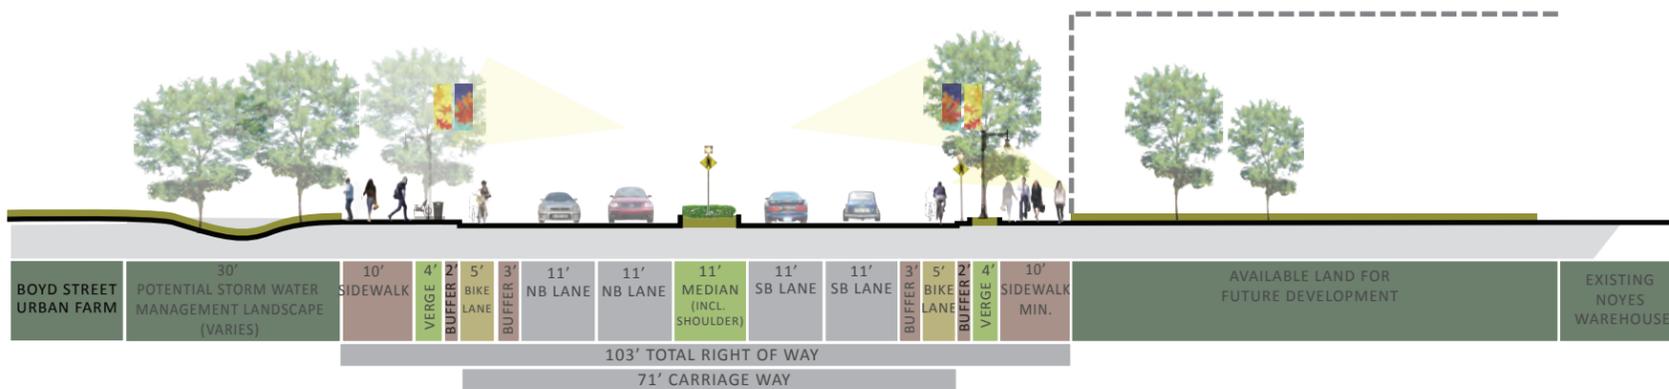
Section BB' Through Franklin Street Near Oxford St. Looking South
